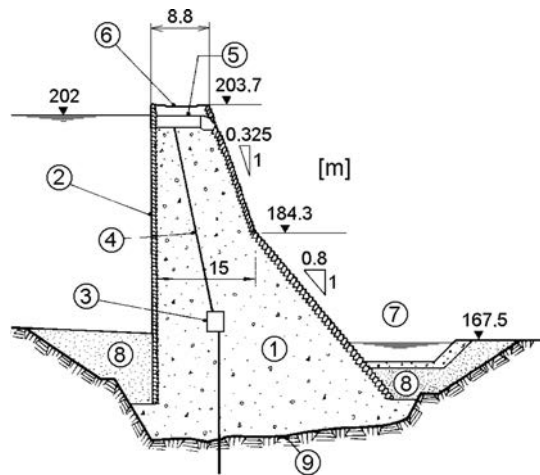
Typical cross-section of New Victoria dam, Australia (after (Wark & Mann 1992). (1) Roller-compacted concrete; (2) lining of conventional concrete; (3) main gallery; (4) drainage; (5) overflow crest; (6) roadway; (7) stilling basin; (8) earthfill; (9) foundation.
